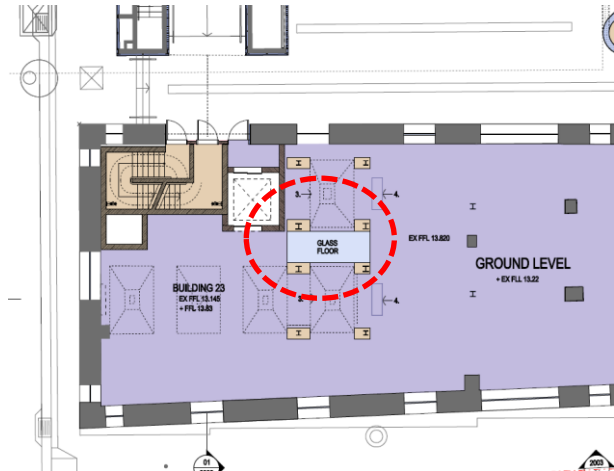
Extract of Ground Floor Proposed Plan – proposed glazed walkway to view Basement interpretation is circled and the remaining 5 funnels are indicated
